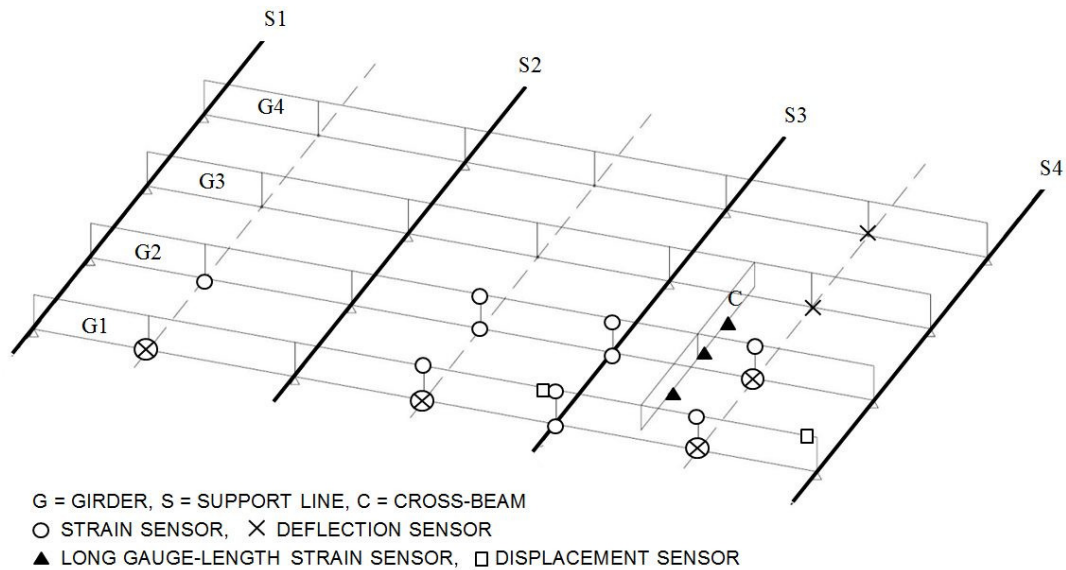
Schematic drawing of Jeesiöjoki Bridge showing the location of each sensor. To simplify the figure, not all the crossbeams are shown in the drawing.
